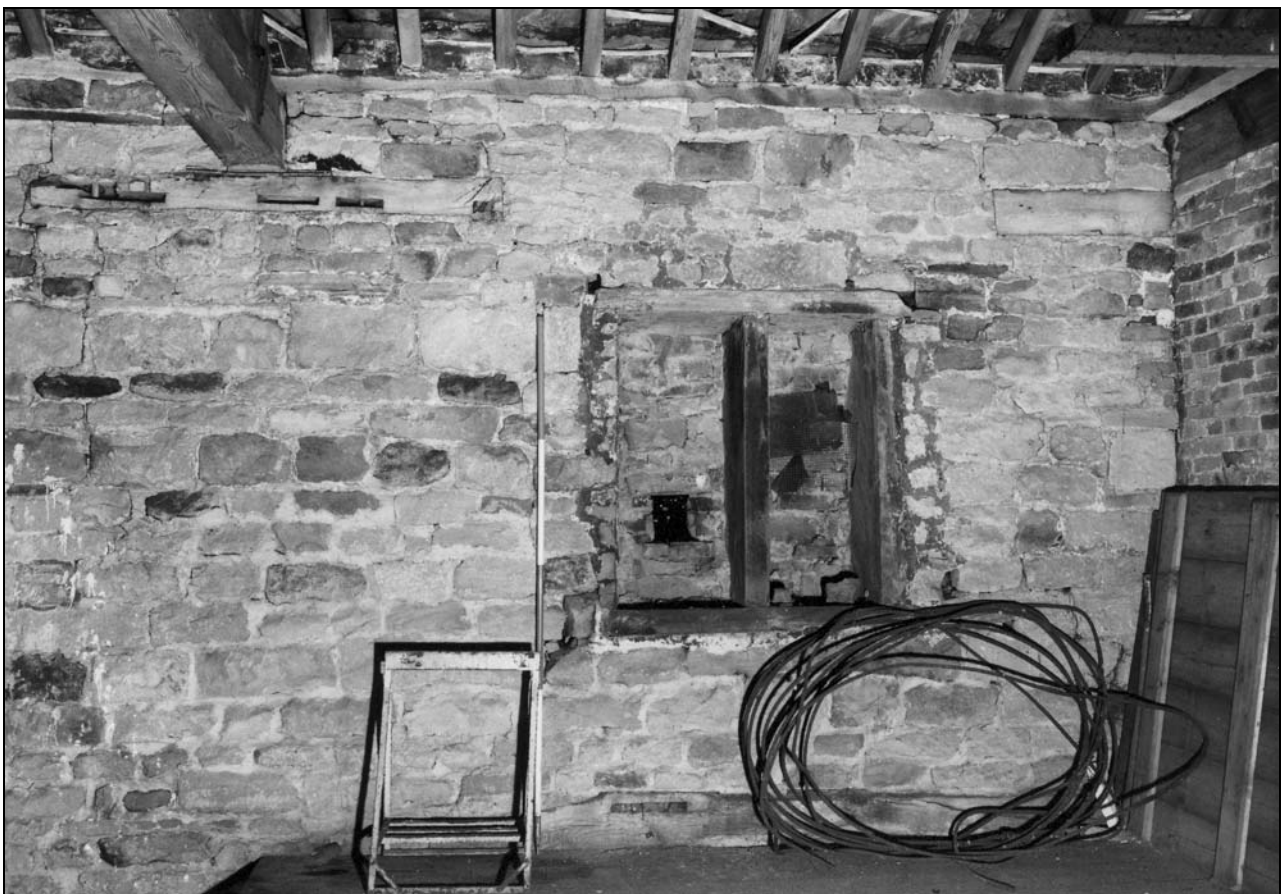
Internal view of inserted and blocked north window to central bay (film 3, frame 17)
